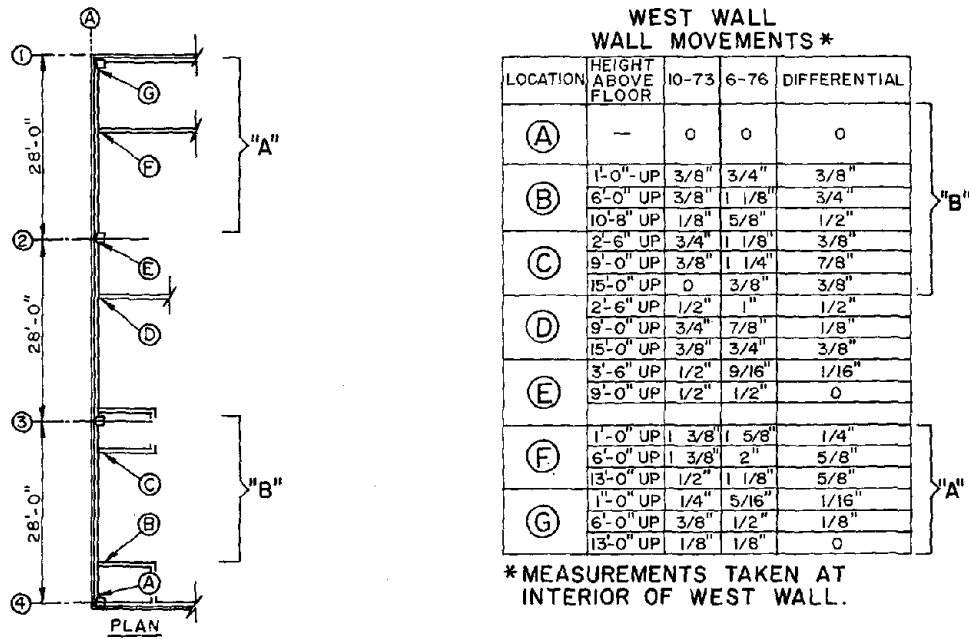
Wall Measurements, West Wall, Bldg. 9204-2E
